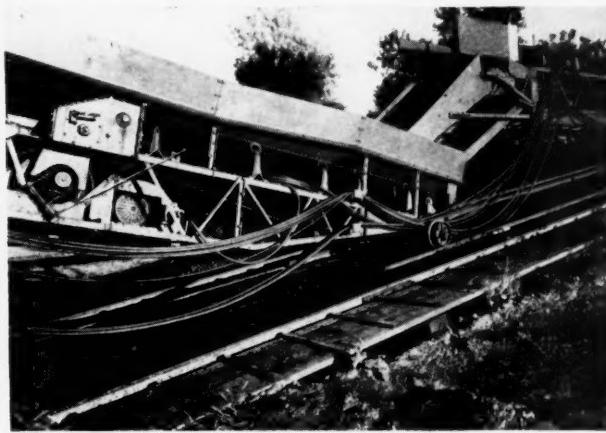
Showing the rubber-covered power and control cables along the conveyors on the ramp. When the conveyors must be pulled up the ramp to take care of rising water, the extra footage is coiled up and looped in the side hooks.
